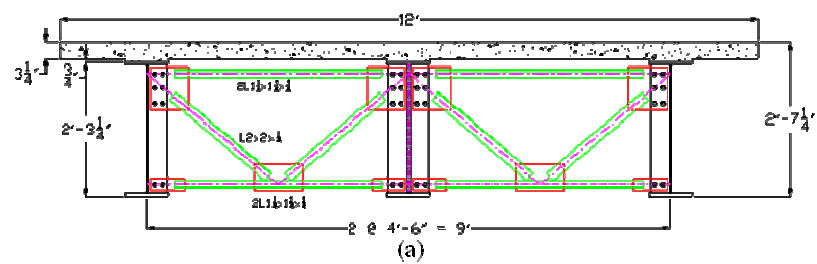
Bridge Model and Layout in Large-Scale Structures Laboratory
